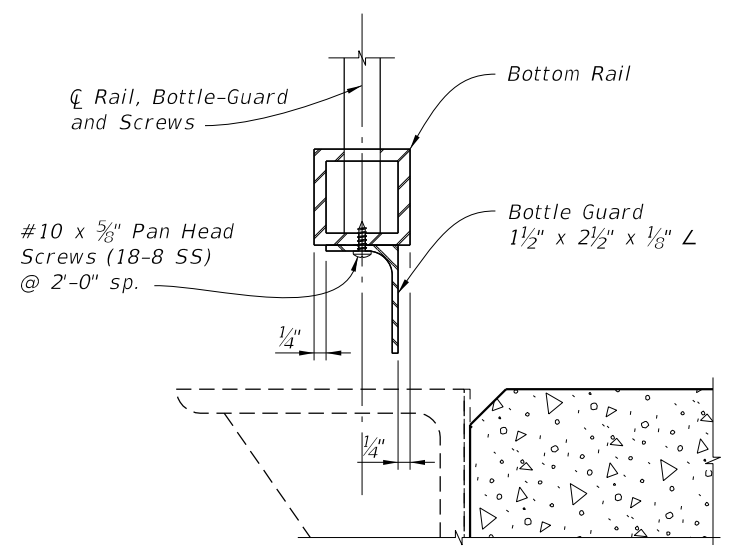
DETAIL "B" EXPANSION JOINT (FIELD SPLICE SIMILAR)
